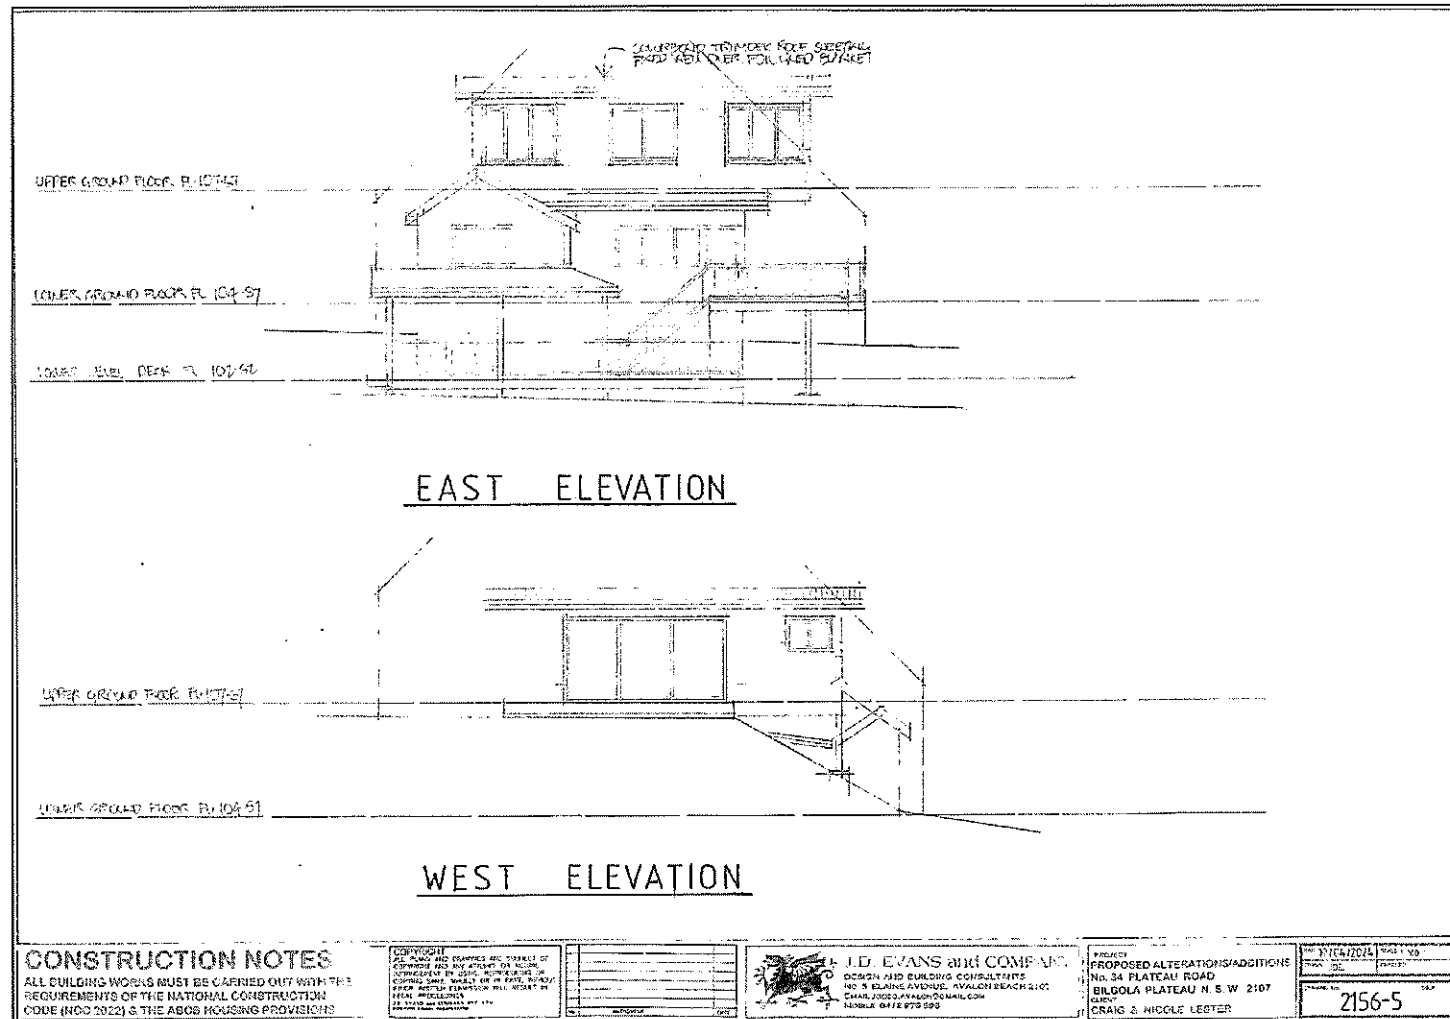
ILLUSTRATES PROPOSED EAST & WEST ELEVATION
